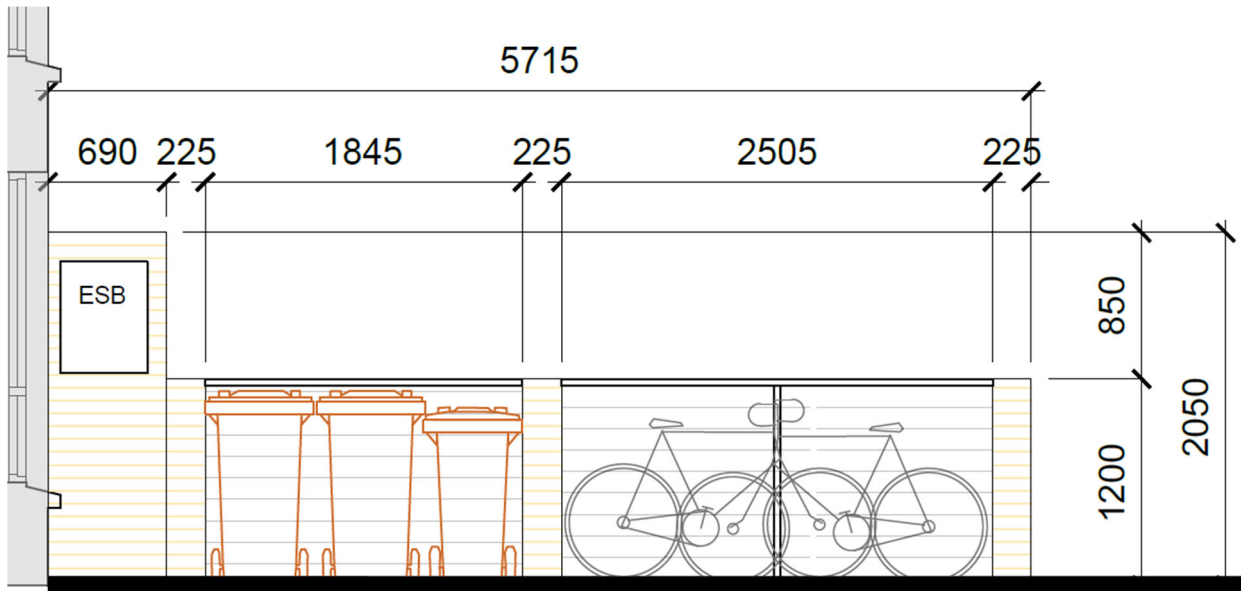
Typical Bike And Bin Store Layout plan (Drawing KIN-MCORM-AR-00-DR-P4-XX-CA1-2200 - MCORM Architecture)
